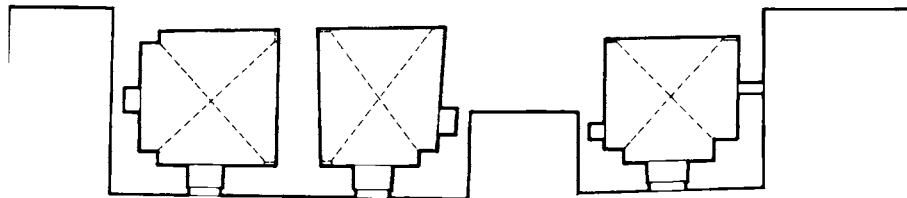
Khalwat Qitas and Khalwat Parwiz, basement plan.
